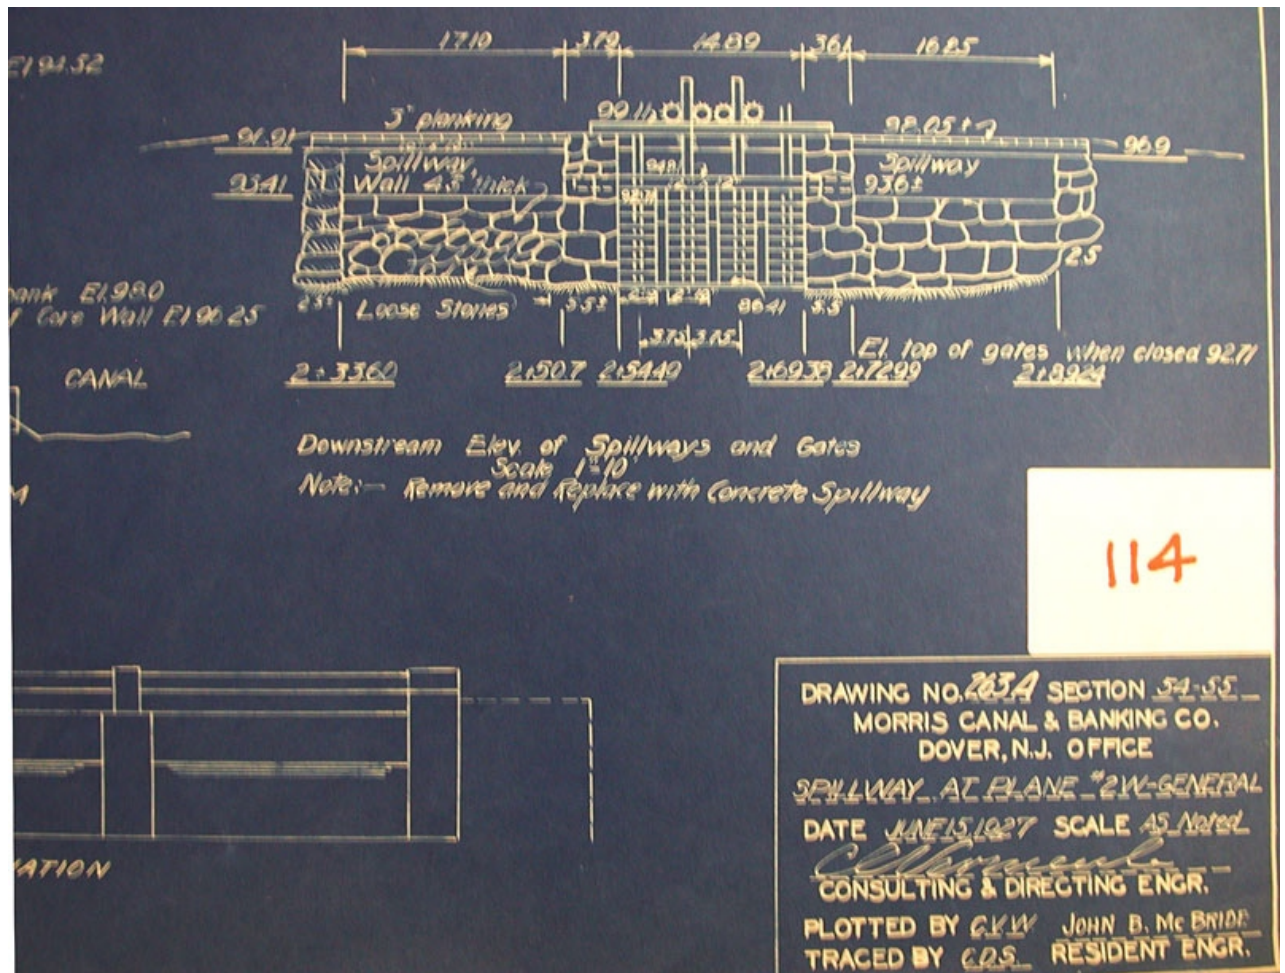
Detail of Vermeule's original 1927 plan for a cement spillway similar to weir at Furnace Pond, showing exiting conditions with mid-19th century heavy wooden and masonry dam structure that preceded it (*Digital photo by author, courtesy of NJ State Archives, Box 37, item Number 1, Plans for work on Section 54-55*).
